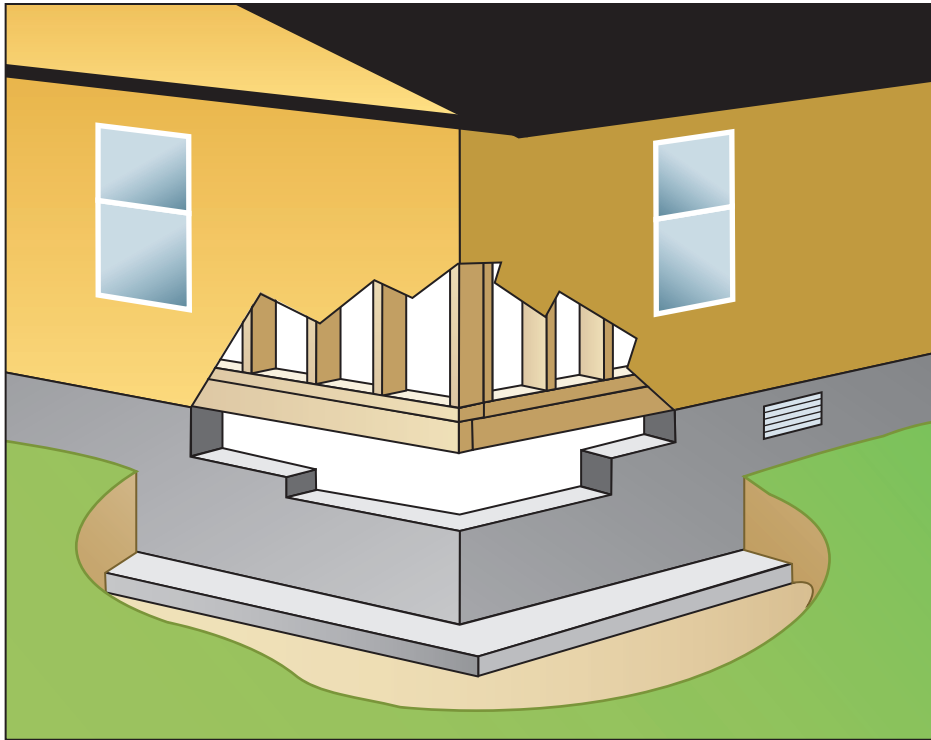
E-1. Existing wood-frame house on crawlspace foundation to be elevated with extended walls and piers
